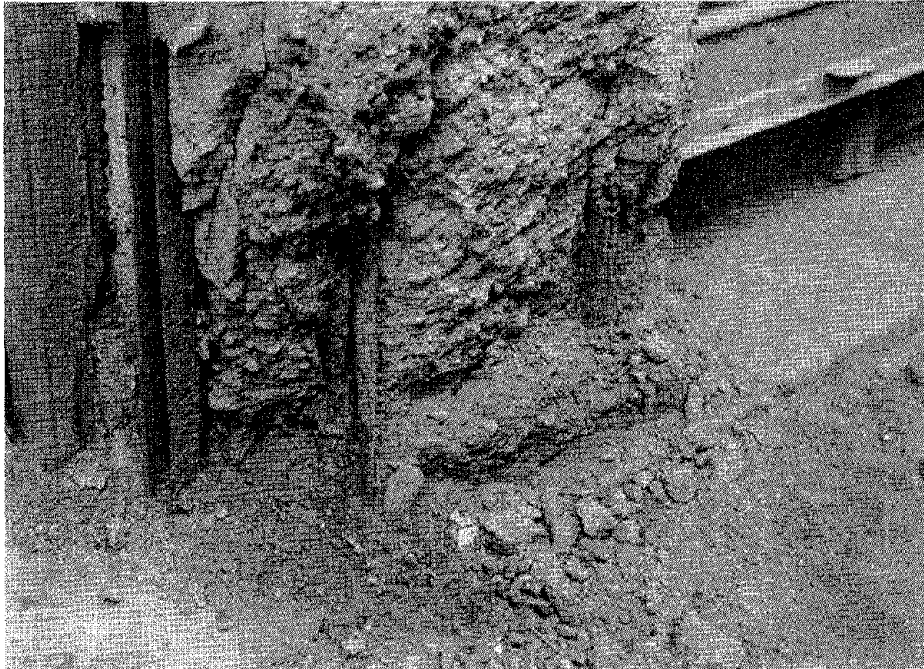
Nearly complete rusting of reinforcing steel bars at the bottom of a column, due to poor concrete quality.
